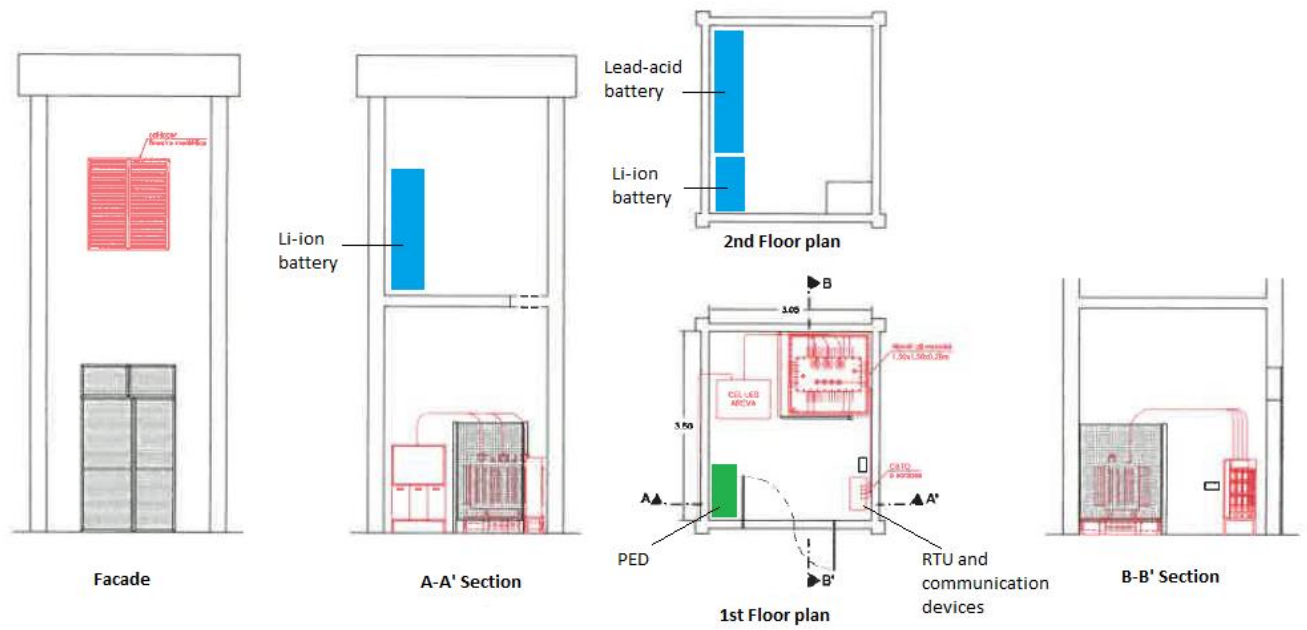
Plan of the floors and vertical sections of SS-B, indicating the positions of PED and batteries
